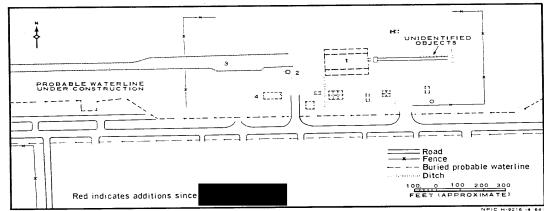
FINAL ASSEMBLY AND CHECKOUT AREA, UNDER CONSTRUCTION.
